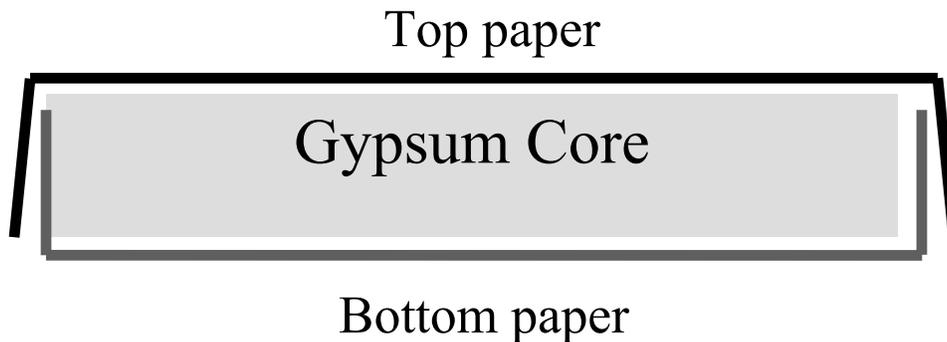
A WALLBOARD SCHEMATIC SHOWING A BOTTOM SHEET WITH GYPSUM SLURRY EXTRUDED ON IT WITH THE SIDE SHEETS COMING TOGETHER AND MERGING WITH THE TOP SHEET TO FORM A RECTANGULAR GYPSUM BOARD.
